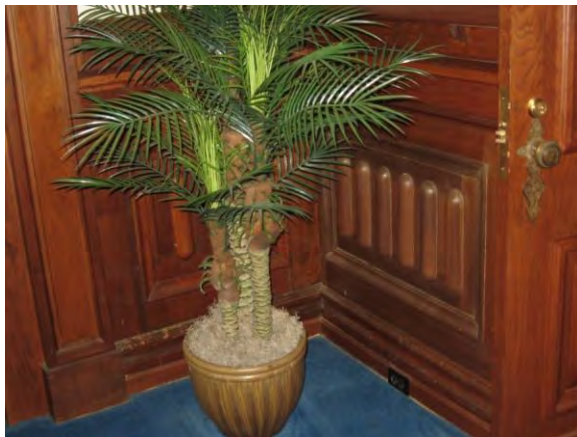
Original and replicated wood wainscoting in the Room 219 suite.
